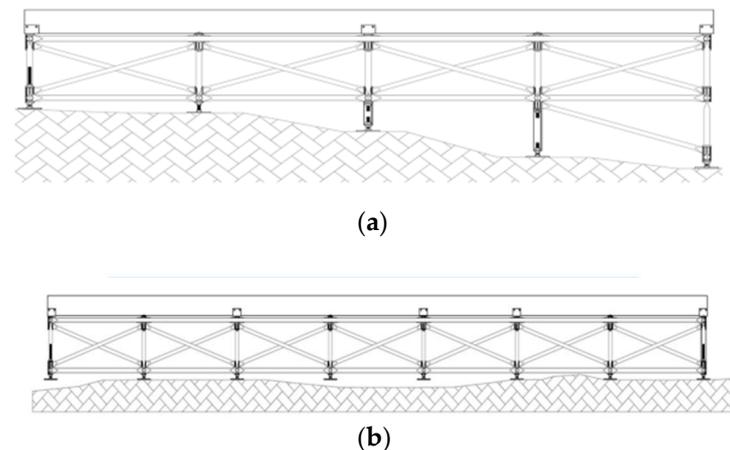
(a) Foundation detail in slope terrain; (b) foundation detail functioning as a rigid slab under frost heave. Courtesy of <http://multipoint-foundations.com> accessed on 16 December 2023.
